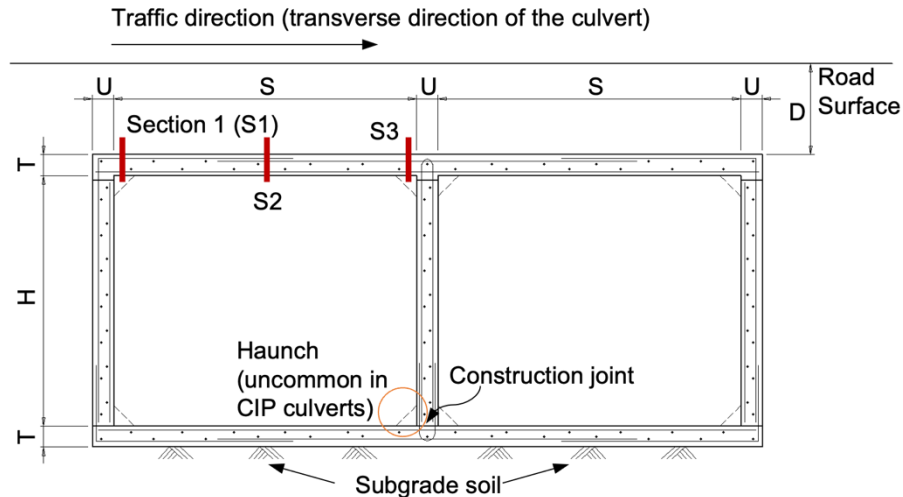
Cross sections of interest (S3 not considered in single-cell culverts)
